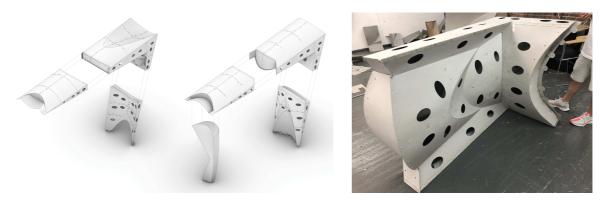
The 3 sub-assemblies per bay, corner sub-assembly of bay A with cylindrical surfaces at joint.
